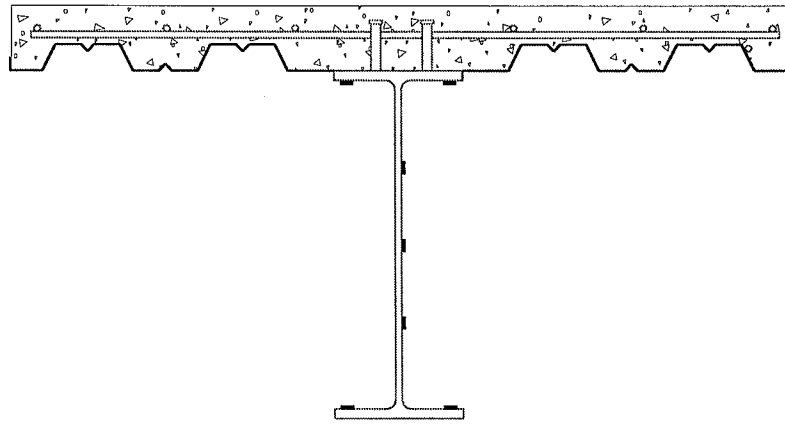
Section B-B: Strain Gages Along the Steel Girder Cross Section
